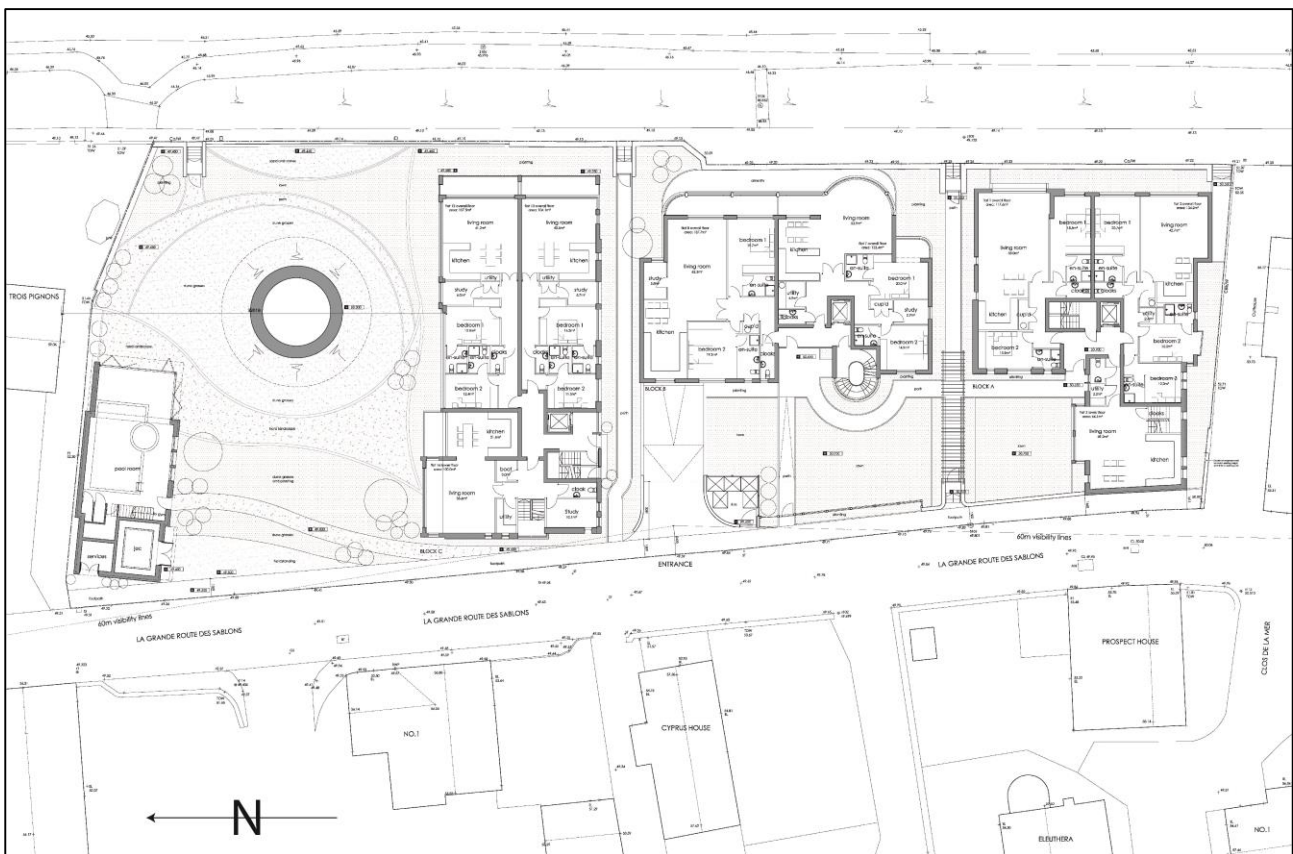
Ground floor plan showing footings of Apartment Blocks A-C and pool room with associated landscaping. Apartment C is the block closest to Keppel Tower (© Morris Architects). Note: Please refer to original architect drawings for full scaled and detailed information.
